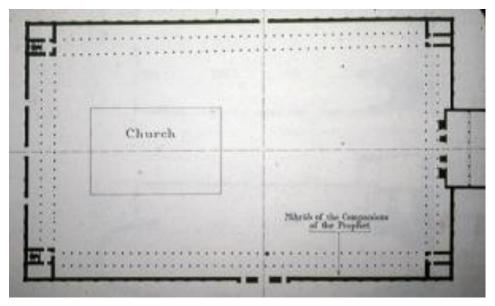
The old St. John's Church plan (Creswell, 1969)
